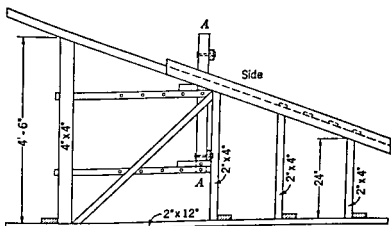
Diagram of a breeding stock, showing details of construction. (University of Illinois.)
